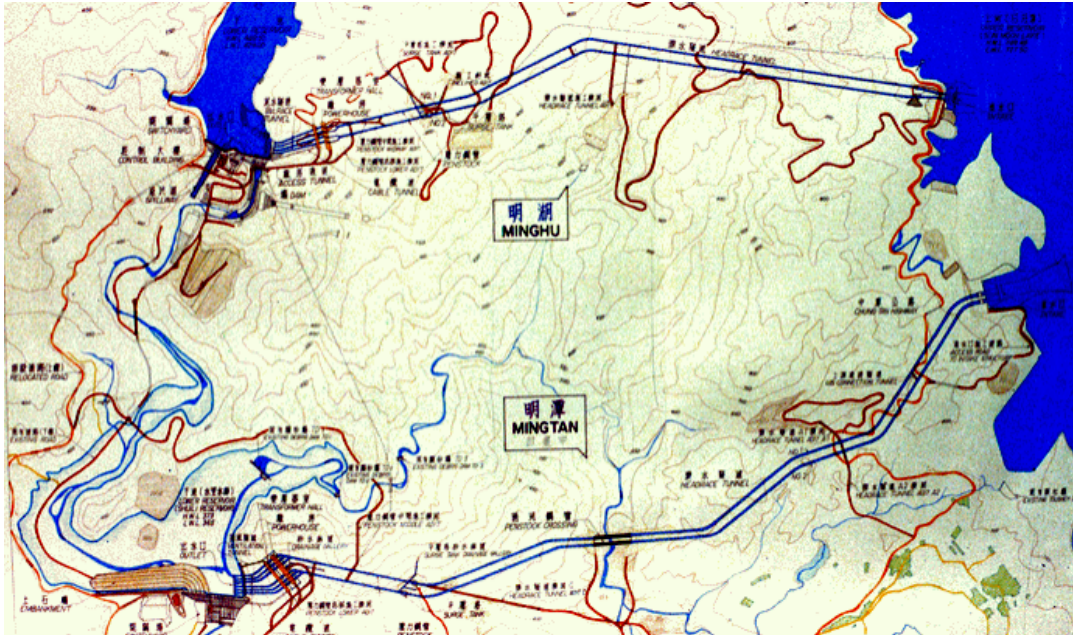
Plan showing the layout of the Minghu Pumped Storage Project (top) and Mingtan Pumped Storage Project (bottom).
